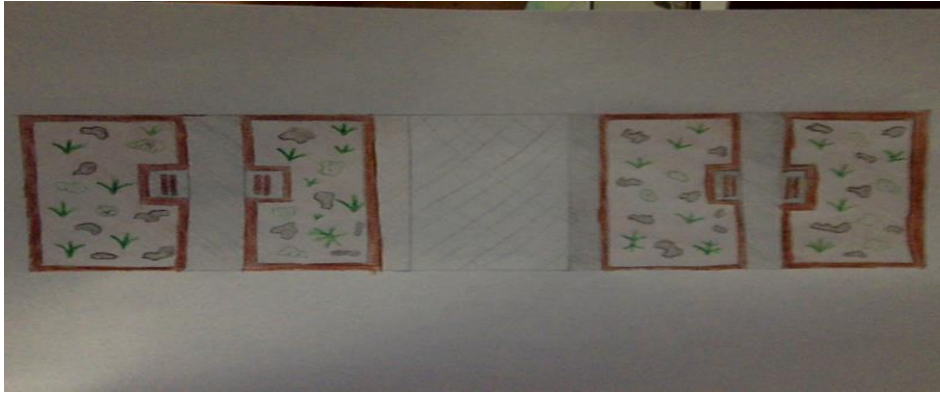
Xeriscaped Planters have three features to the design. The first being the planters themselves with zero-irrigation plants located in them. The second would be the benches that are embedded into the planter area. The third would be walkways in the middle and on the ends of the planters.
